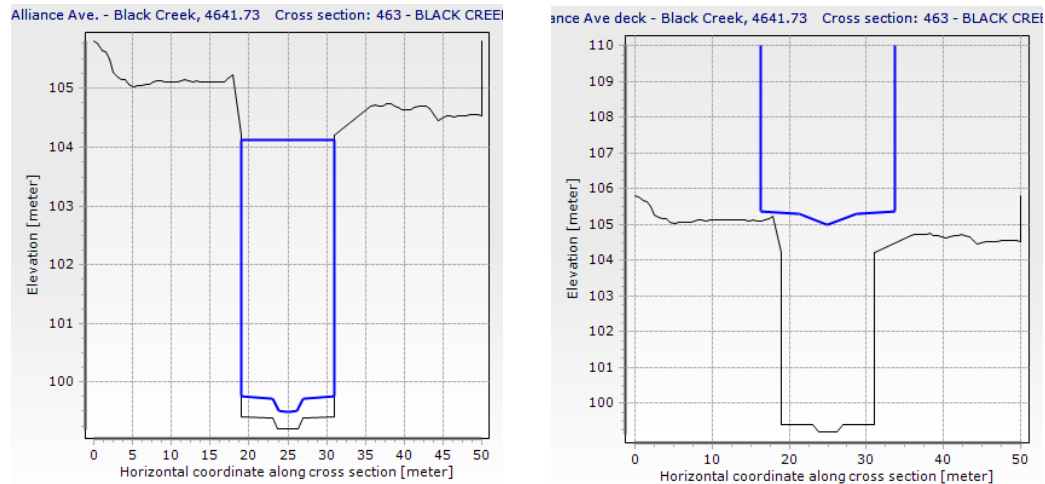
Alliance Avenue Bridge Culvert and Weir Geometries
